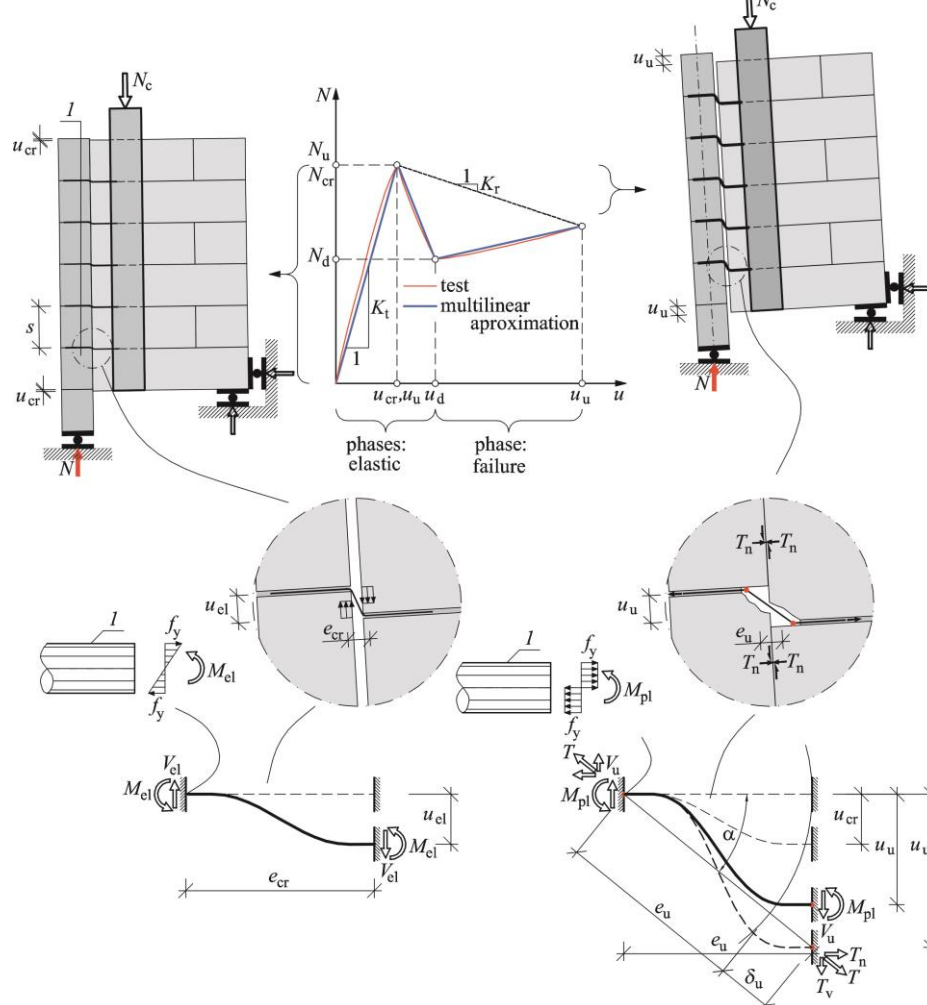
Approximation of work of reinforced joint between masonry walls (1 – connector)
